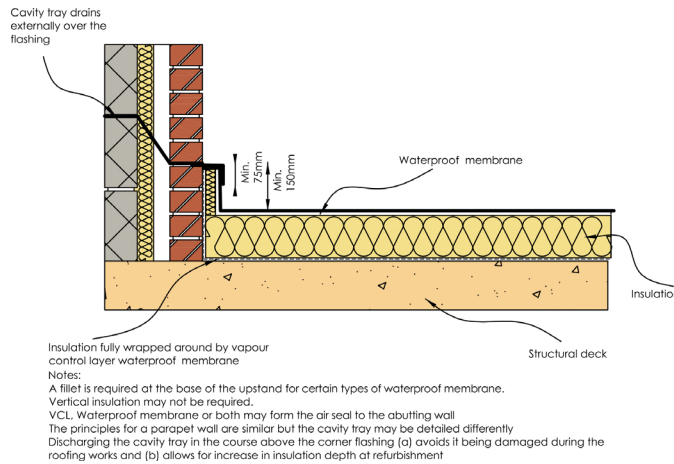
Principles of detailing: an example of warm deck roof at an abutment
